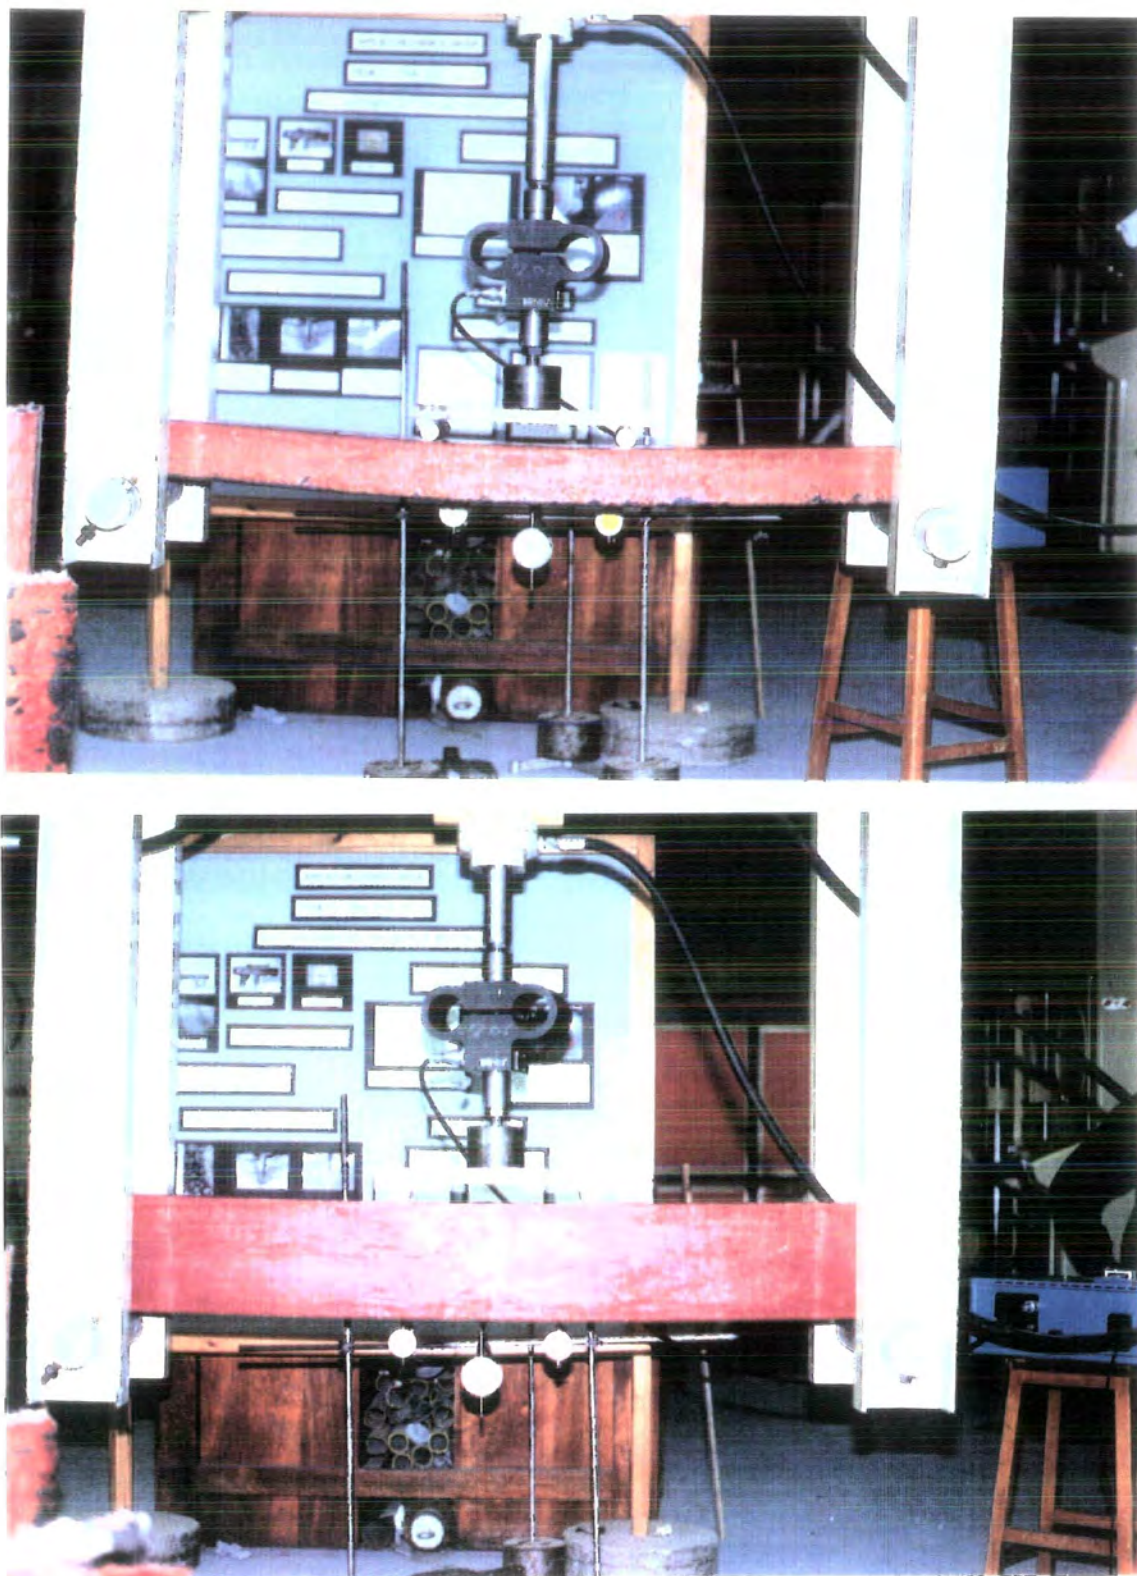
General loading, support and instrumentation arrangement of the test beams.
